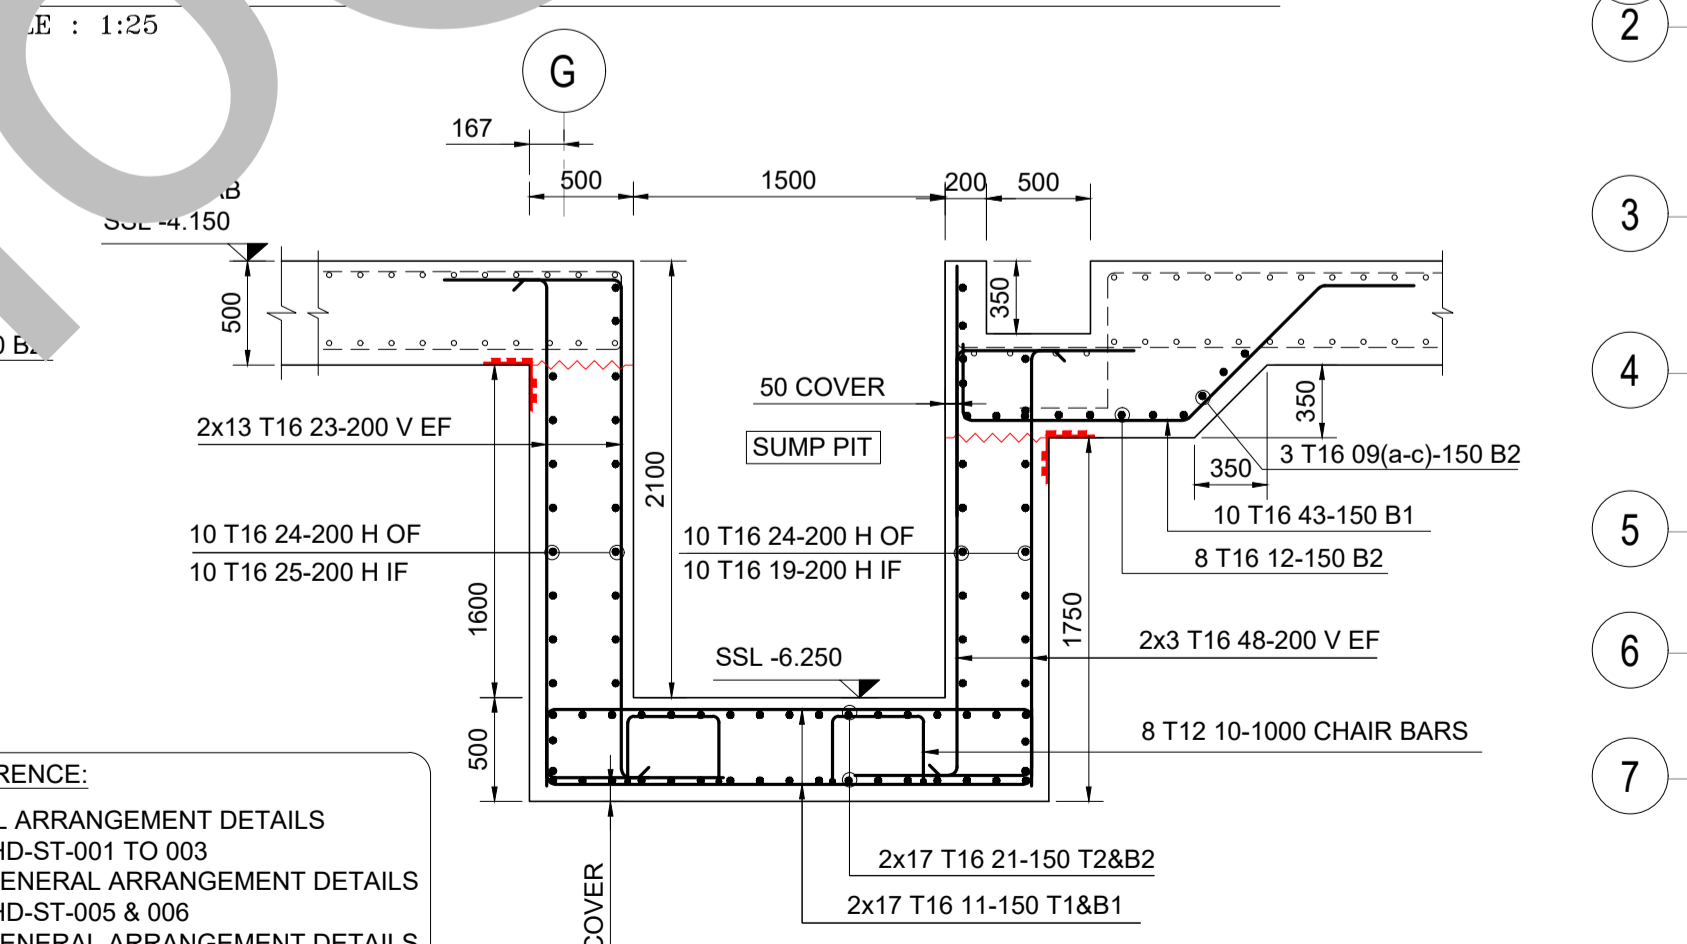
DETAIL-C SUMP PIT BASE SLAB REINFORCEMENT DETAILS
